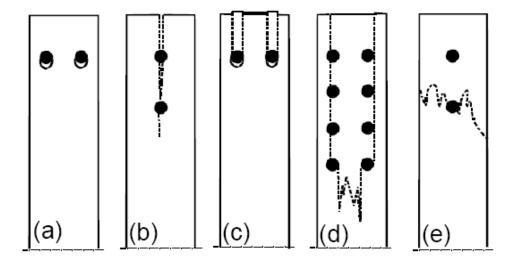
Failure modes for multiple dowel joints loaded in tension parallel to grain: (a) Embedding failure, (b) Splitting failure, (c) Row-shear-out failure, (d) Block-shear failure, (e) Tension failure (Eurocode 5 2002).
